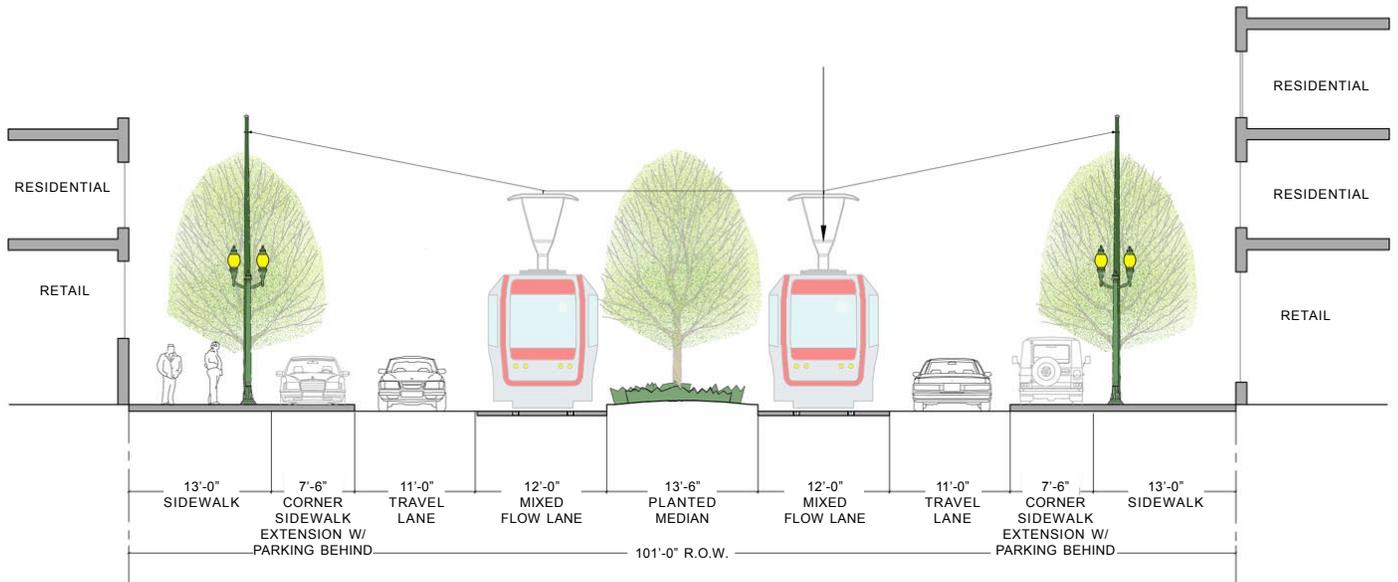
Santa Clara Street with LRT and Parking on Both Sides
